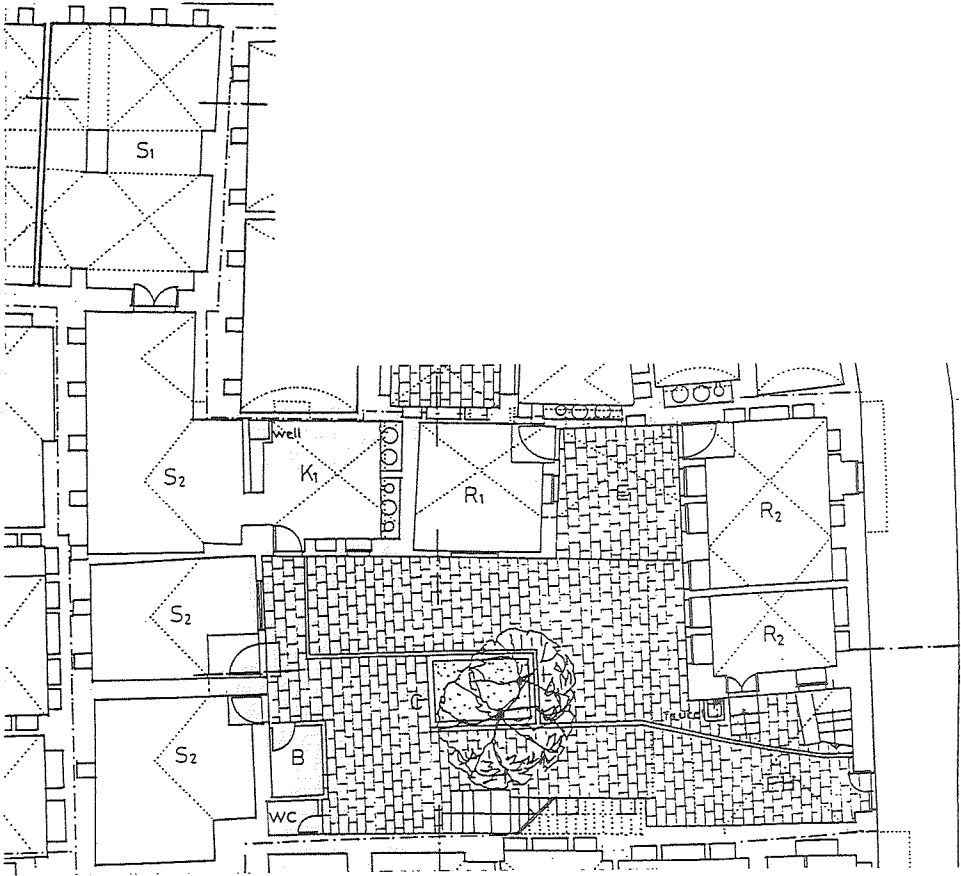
Ground floor plan of "selamlık" part ("katirhane") of Yorgancı House.
